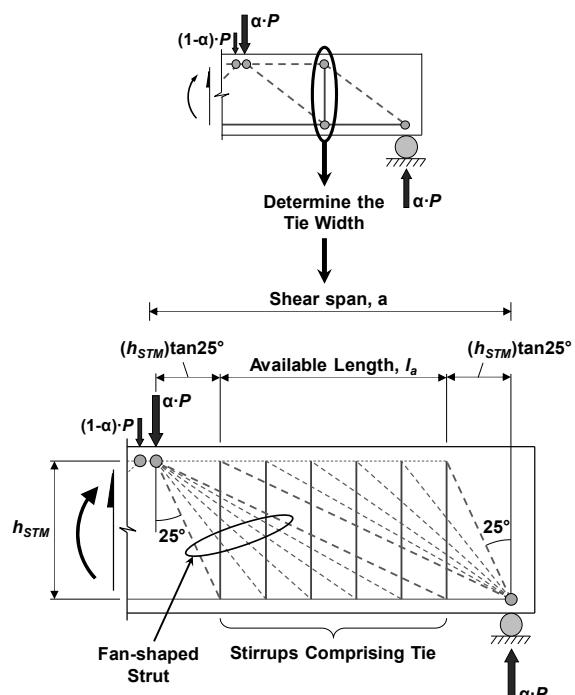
Fan-shaped Strut Engaging Transverse Reinforcement Forming a Tie
